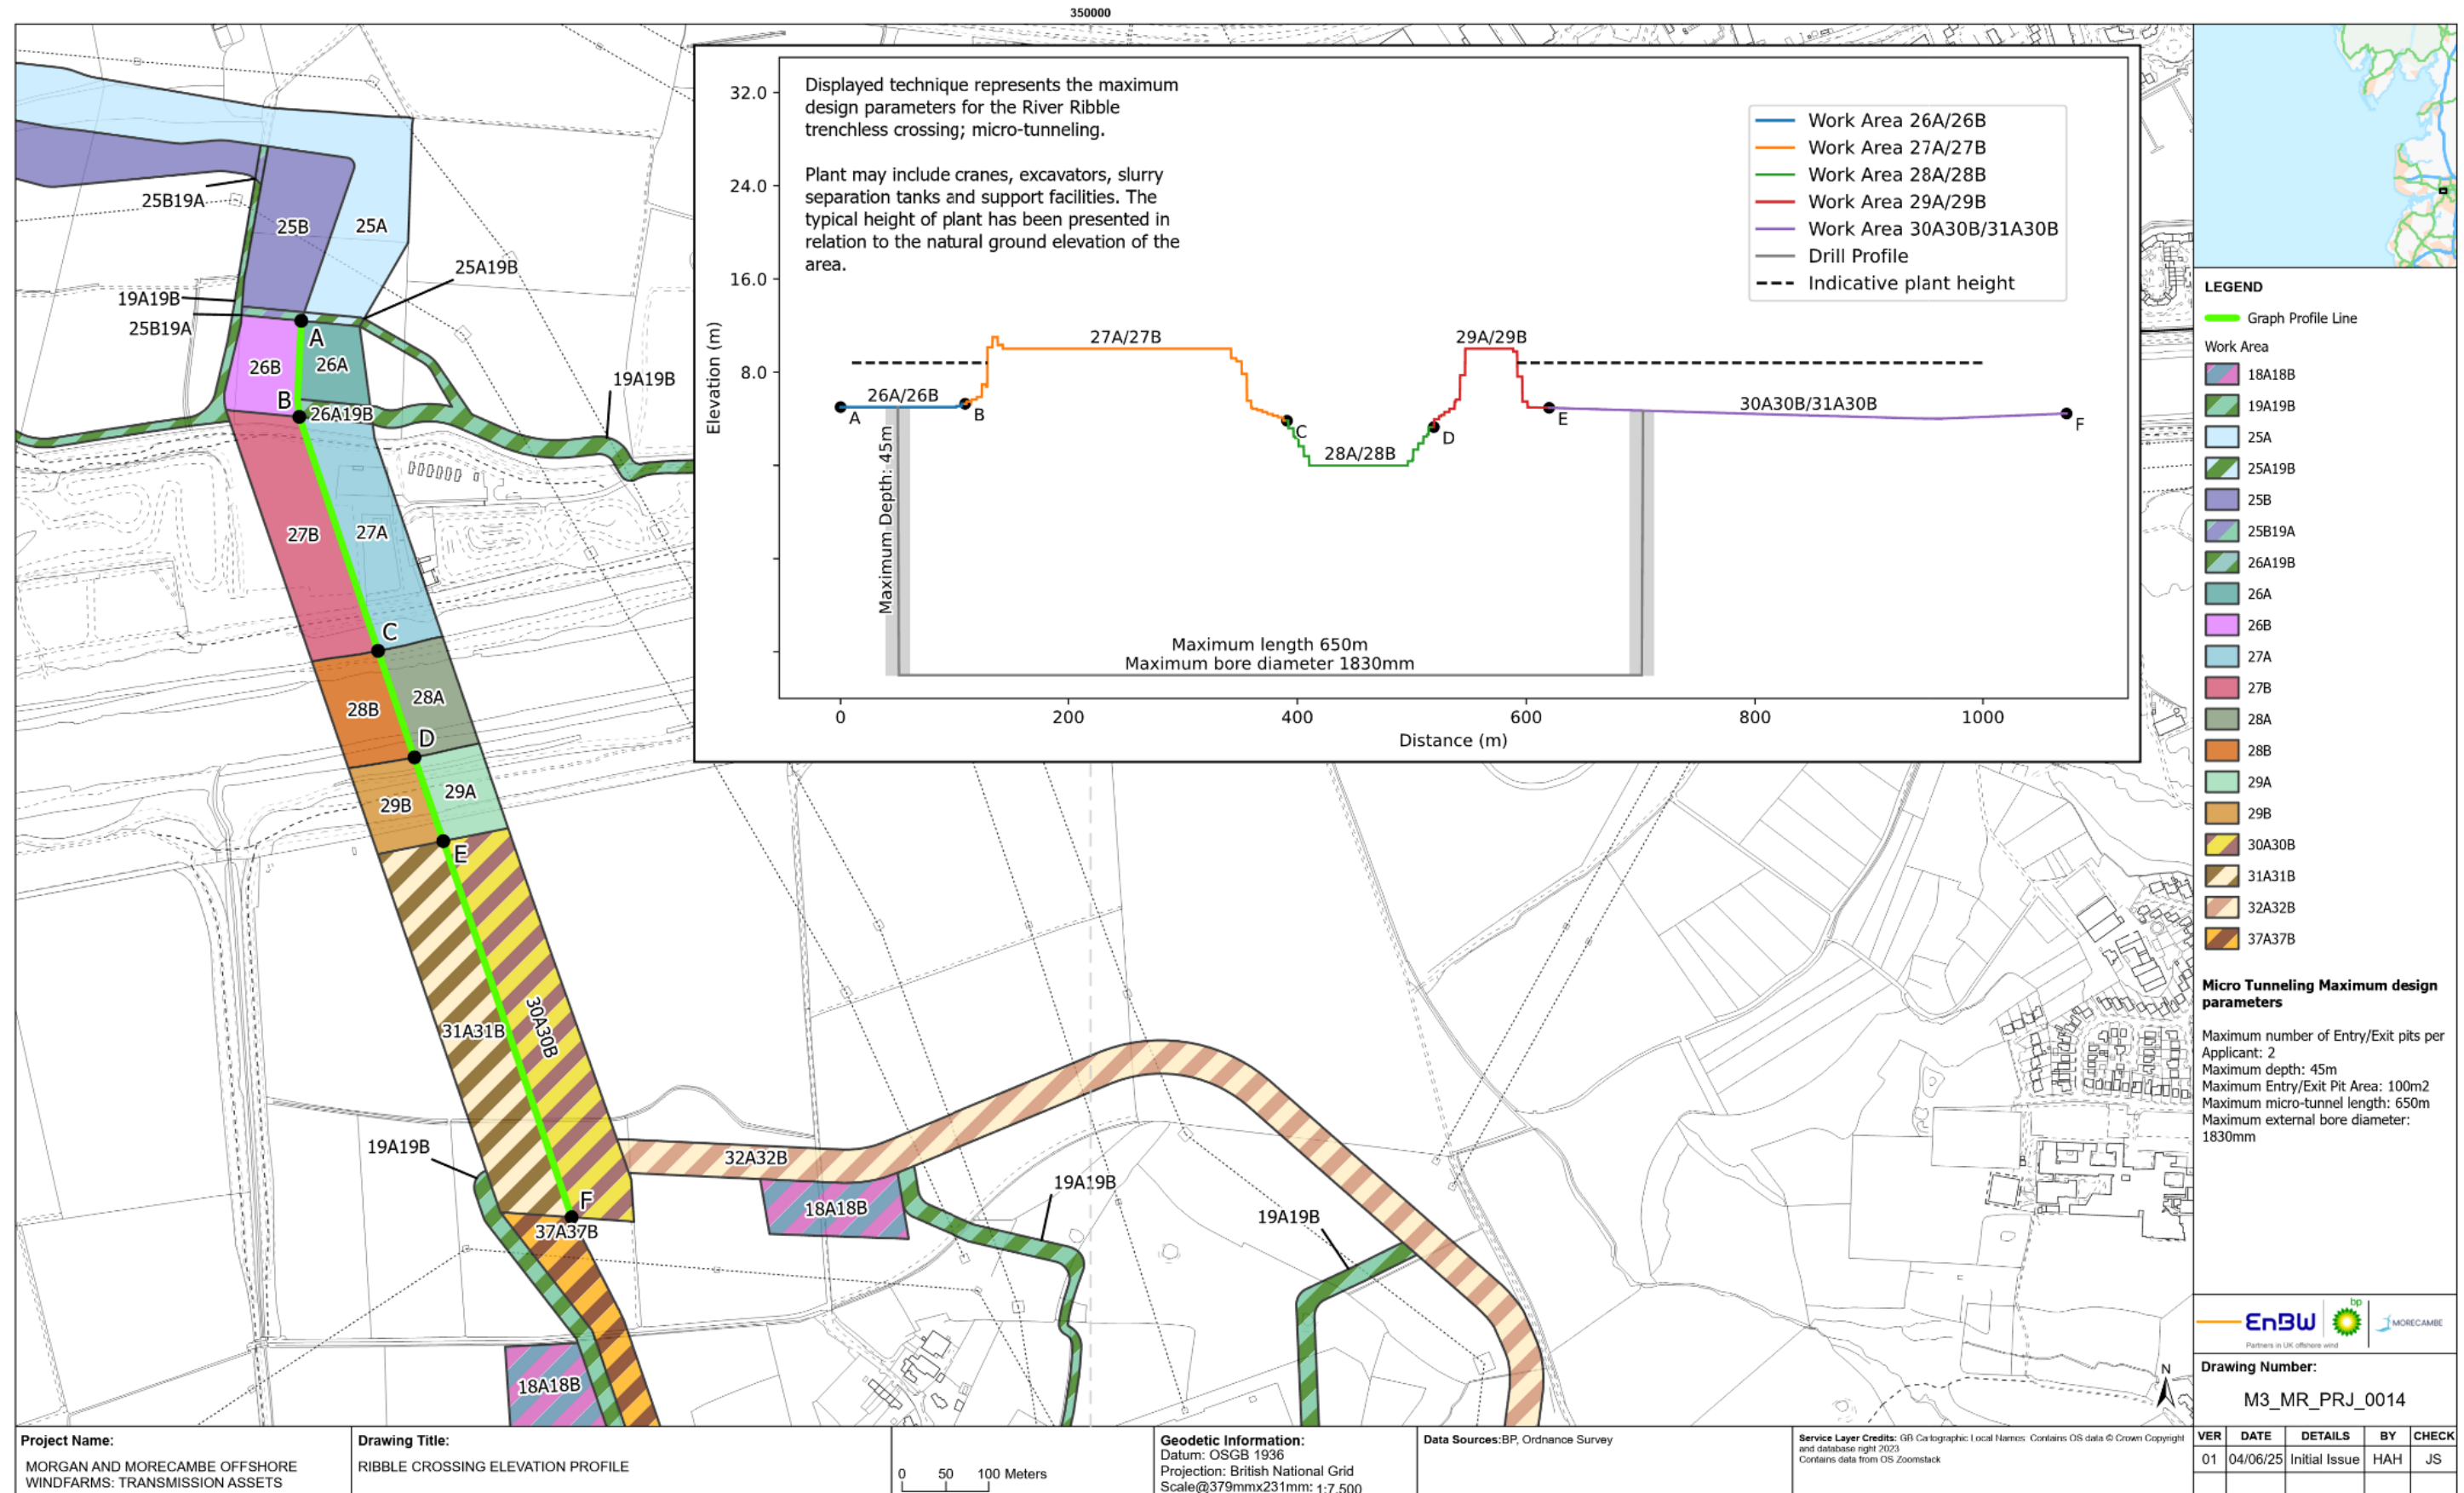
Indicative Cross Section of the River Ribble Crossing (refer to the Onshore Works Plans (APP-154))
